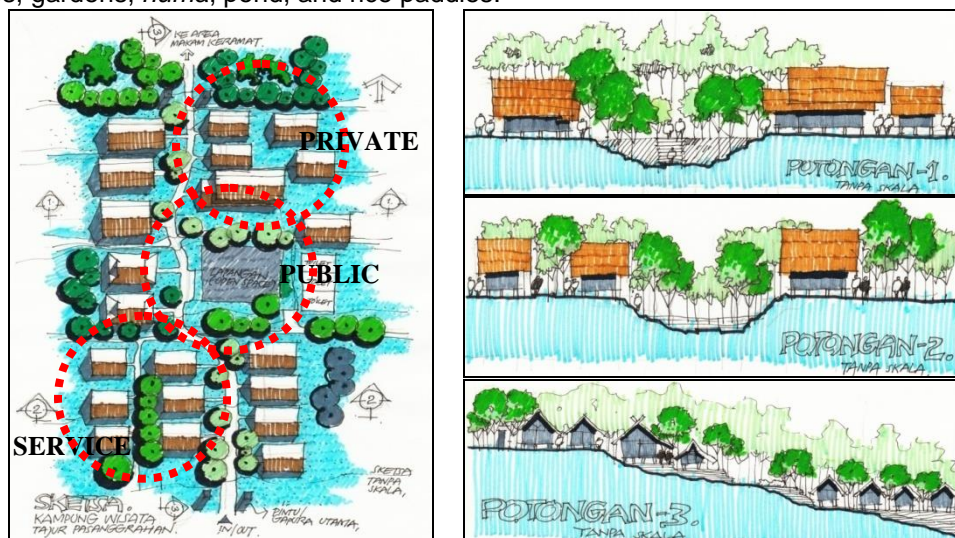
Site plan and section horizontal and zoning concepts of Tajur Kahuripan tourism village
